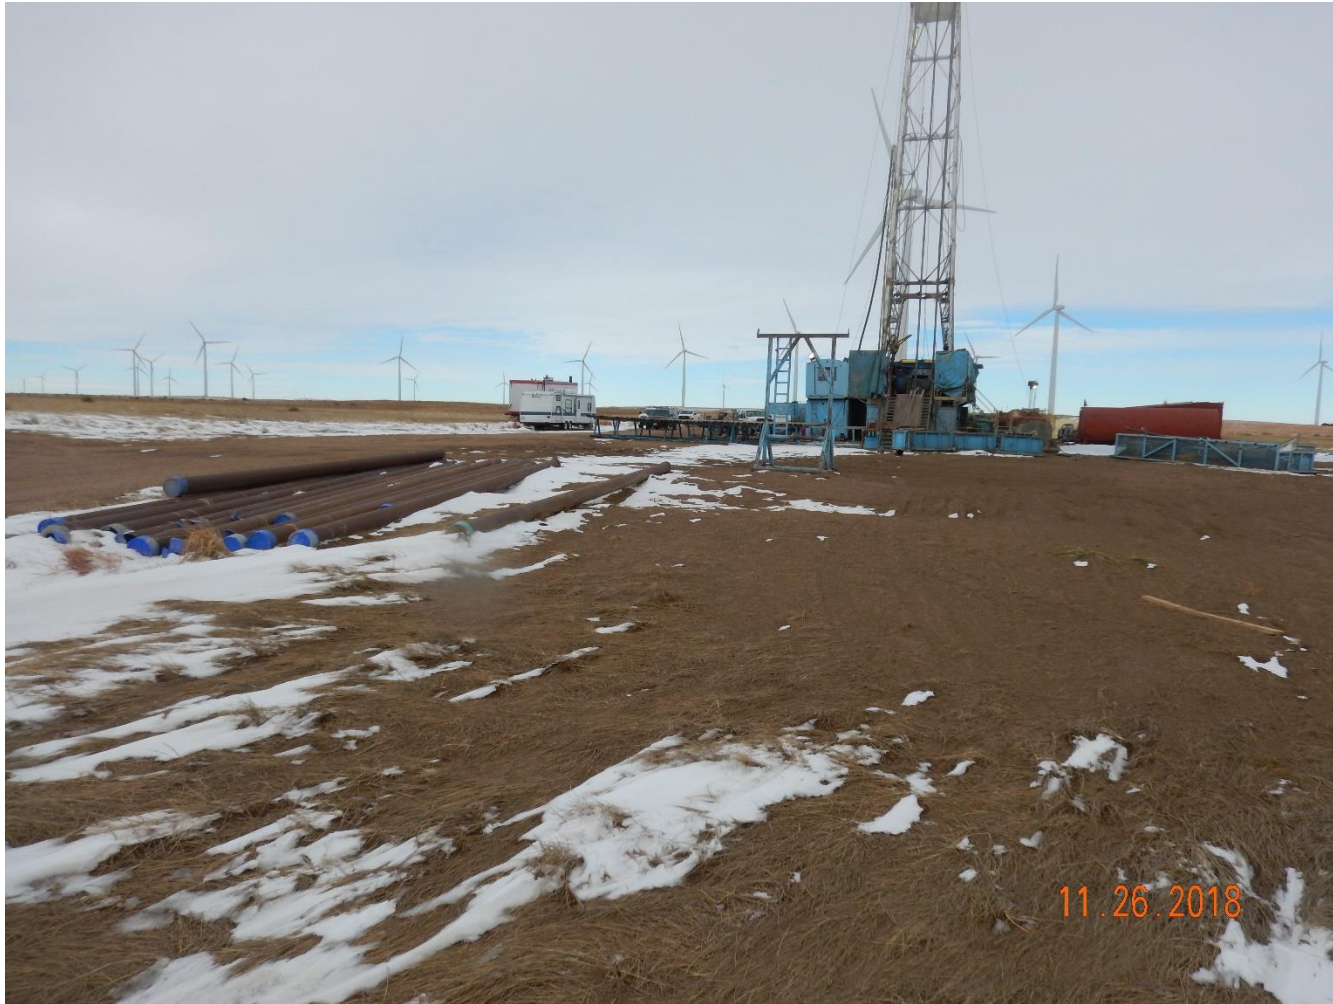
Photo taken from the south end of the location, facing northwest. See comments under photo 15.
